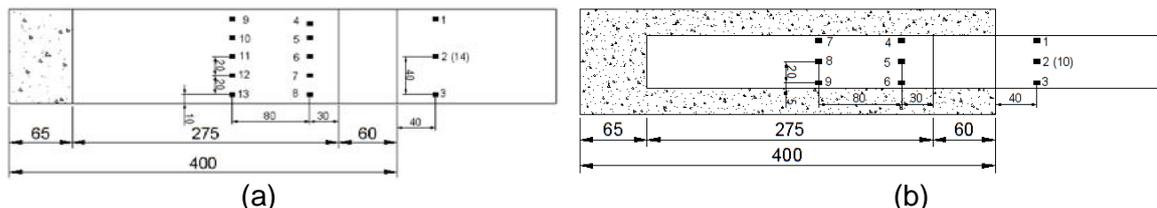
Specimen geometry of (a) specimens with 100mm width CFRP plate and (b) specimens with 50mm width CFRP plate
